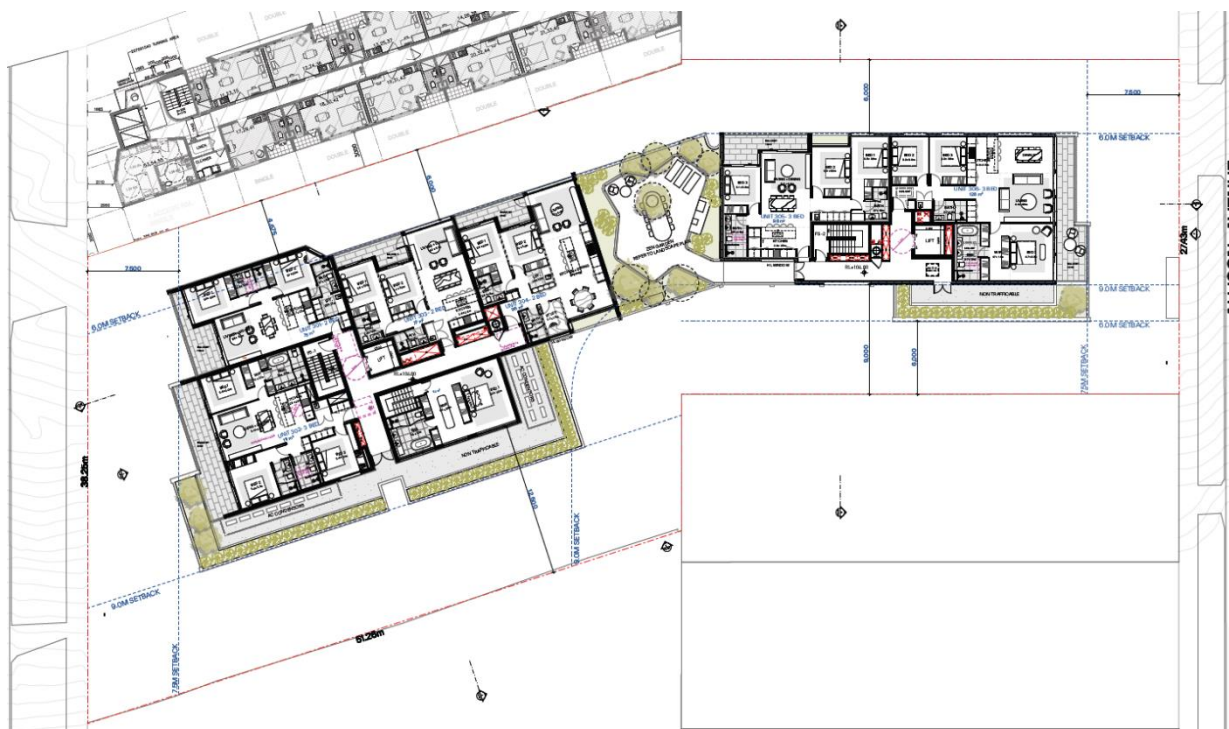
Level 3 Floor Plan showing Fifth Storey Setbacks
